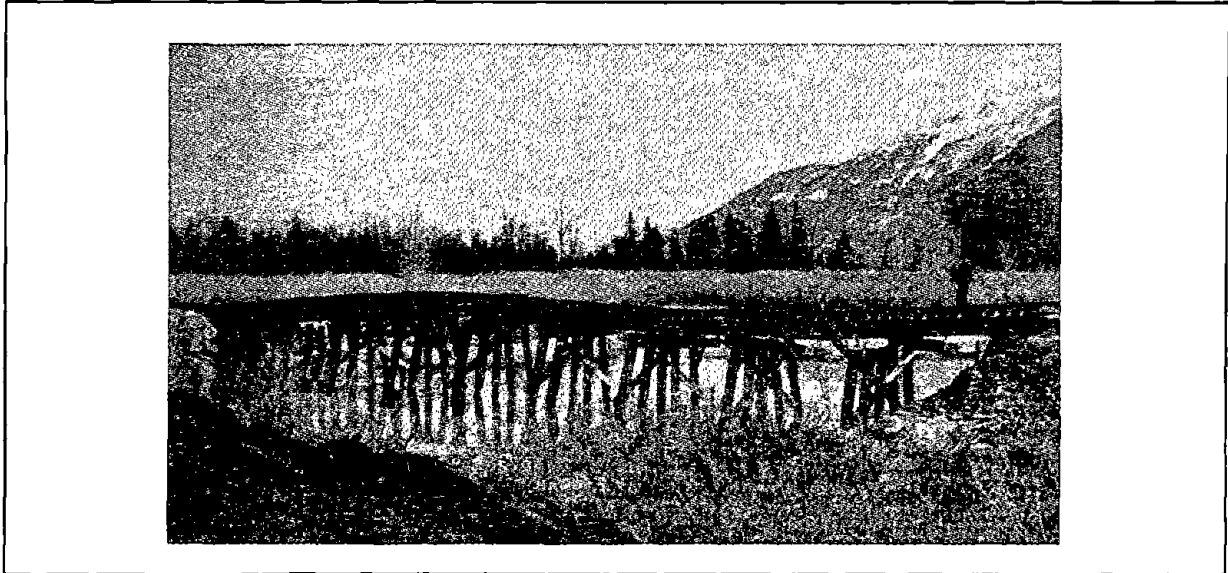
Damage to Railroad Bridge at Mile Post 63.5 (south abutment is on right-hand side, from McCulloch and Bonilla, 1970).
